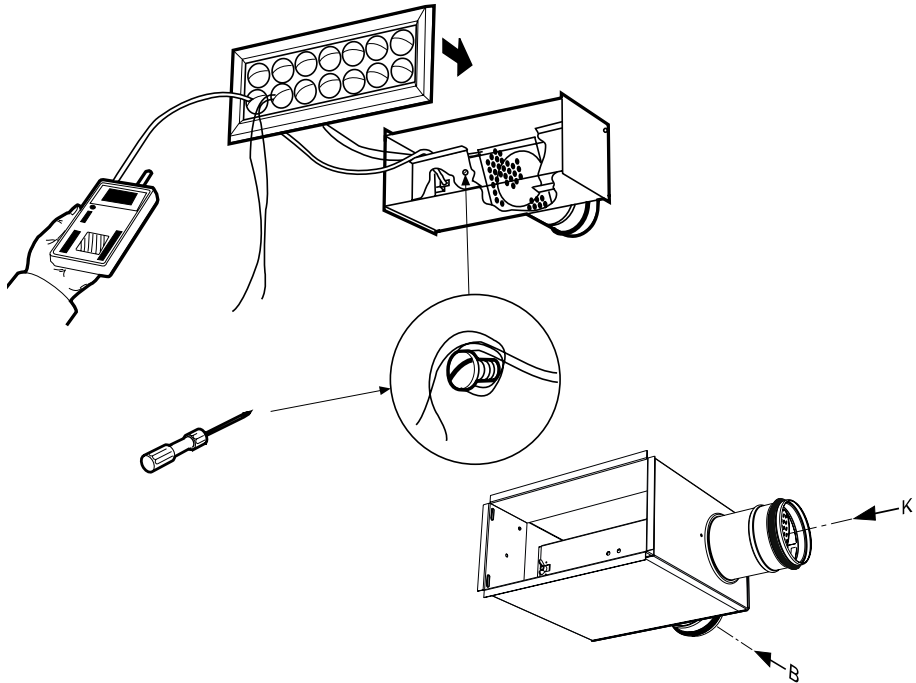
Example ALV, measurement with one tube and connection alternatives, B = Back side, K = Short side.
